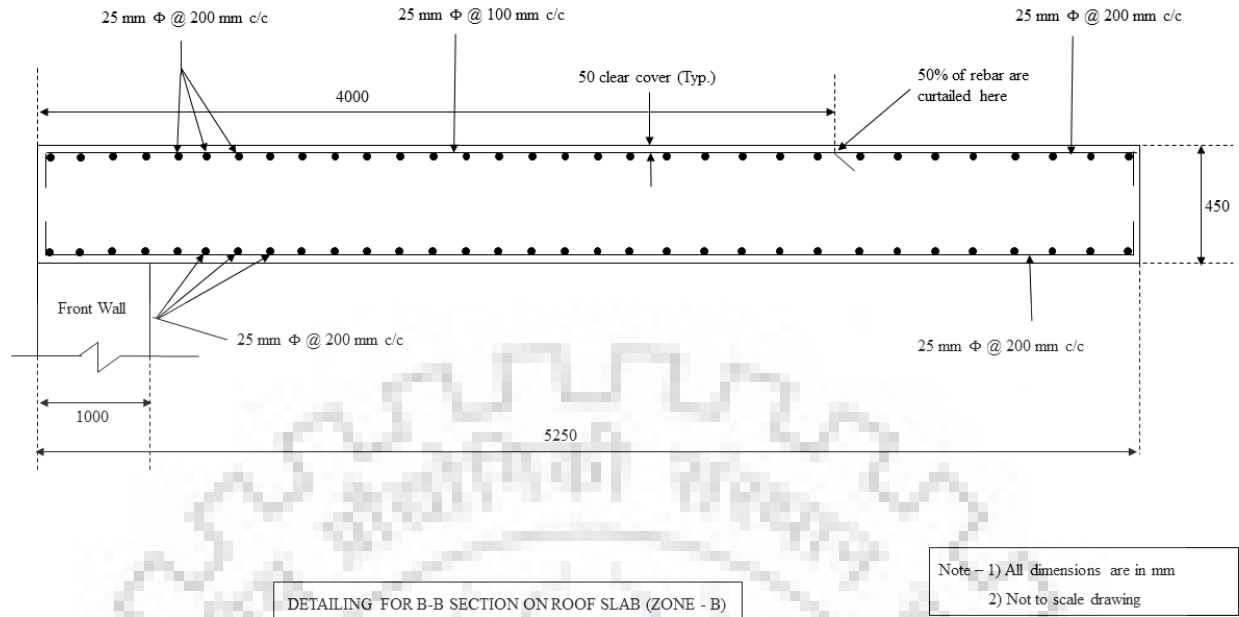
Detailing of Section B-B of roof slab for zone – B
